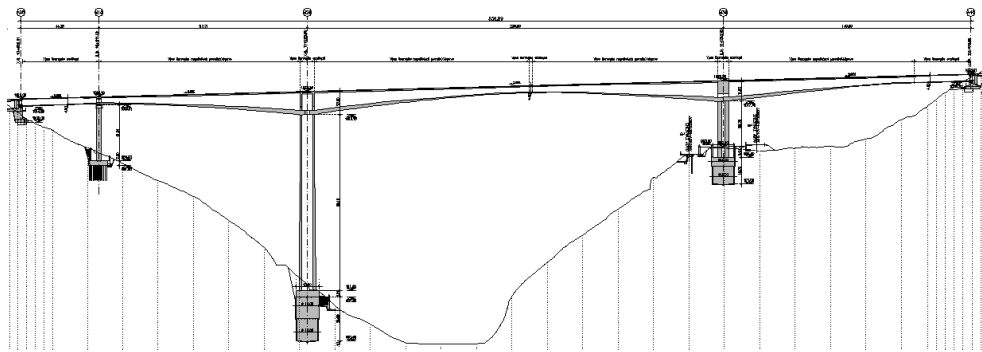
Longitudinal view of the Metsovo ravine bridge
